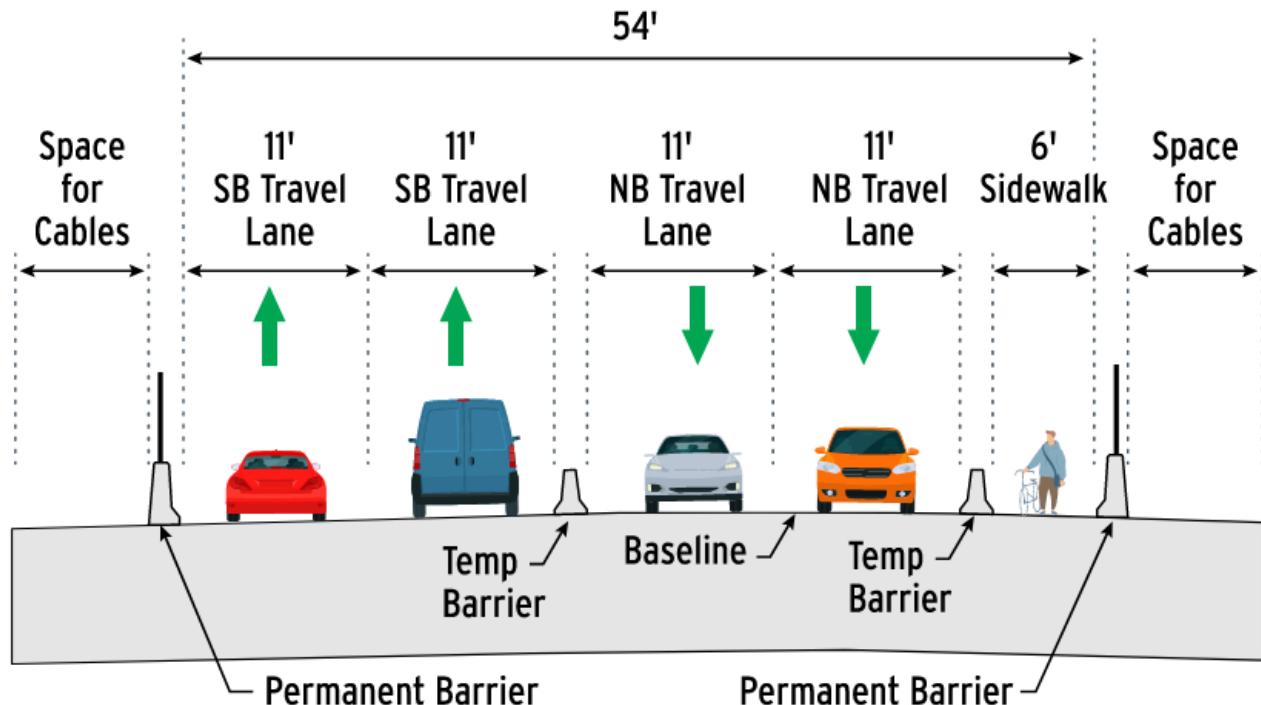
Temporary Typical Main Span Section (Sagamore Bridge Southbound Crossing, looking north)
